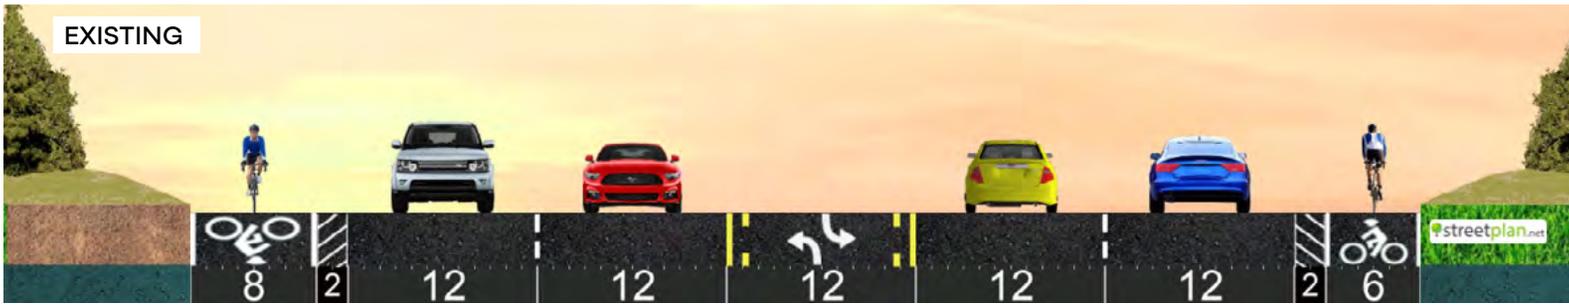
Existing Conditions: LOVR between Palomino Drive and W Foothill Boulevard
